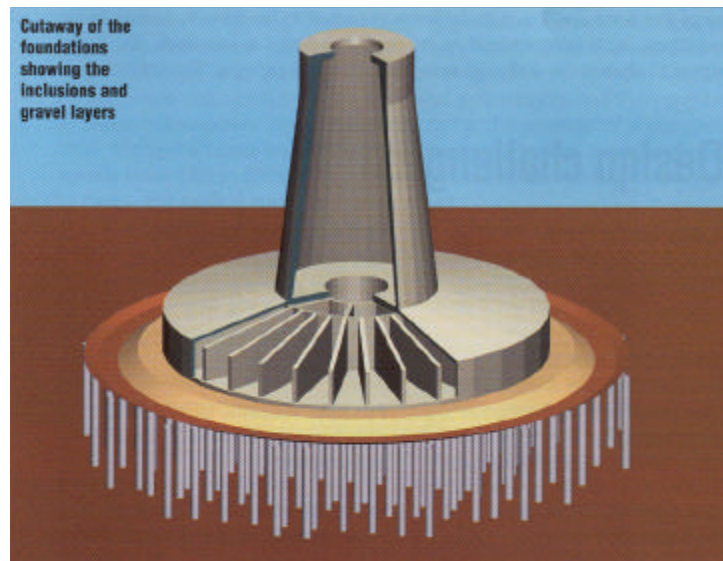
The pier foundation and the soil “nailing” concept of the under construction bridge (Pecker, 1998)
